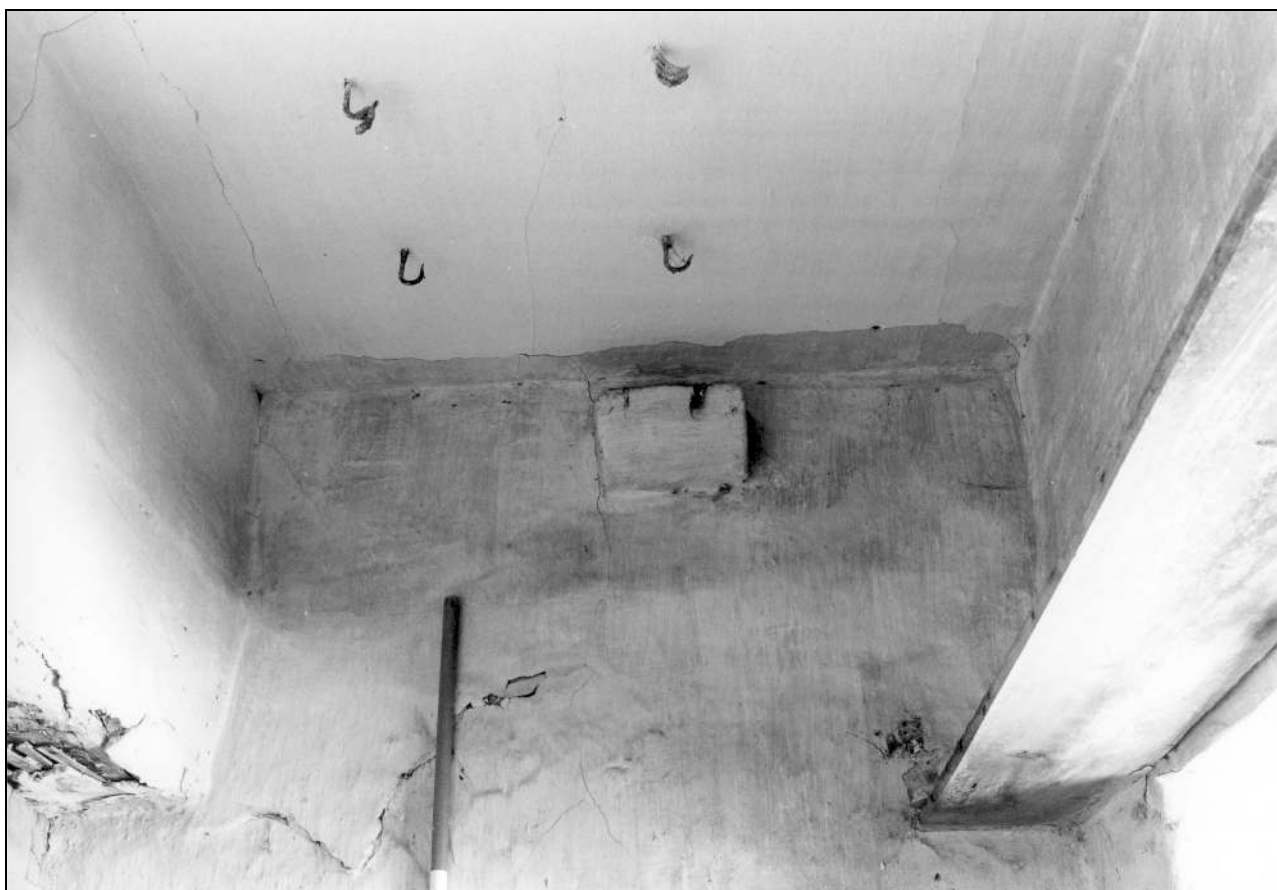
Ceiling hooks in original pantry, from the east (film 3, frame 5)
